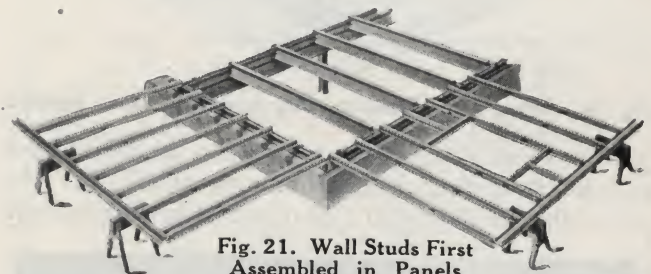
Wall Studs First Assembled in Panels with Girt at the Top
